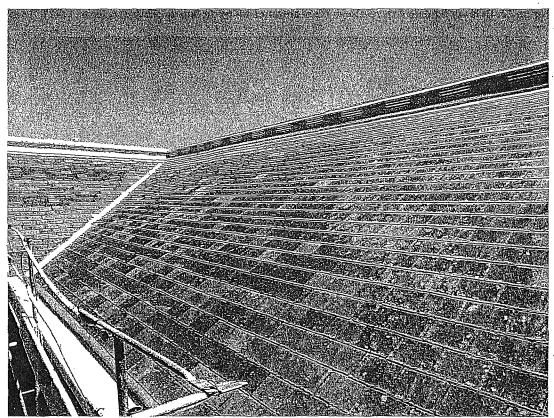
Main roof after restoration. (Palisade Builders, 05/20/2018)
